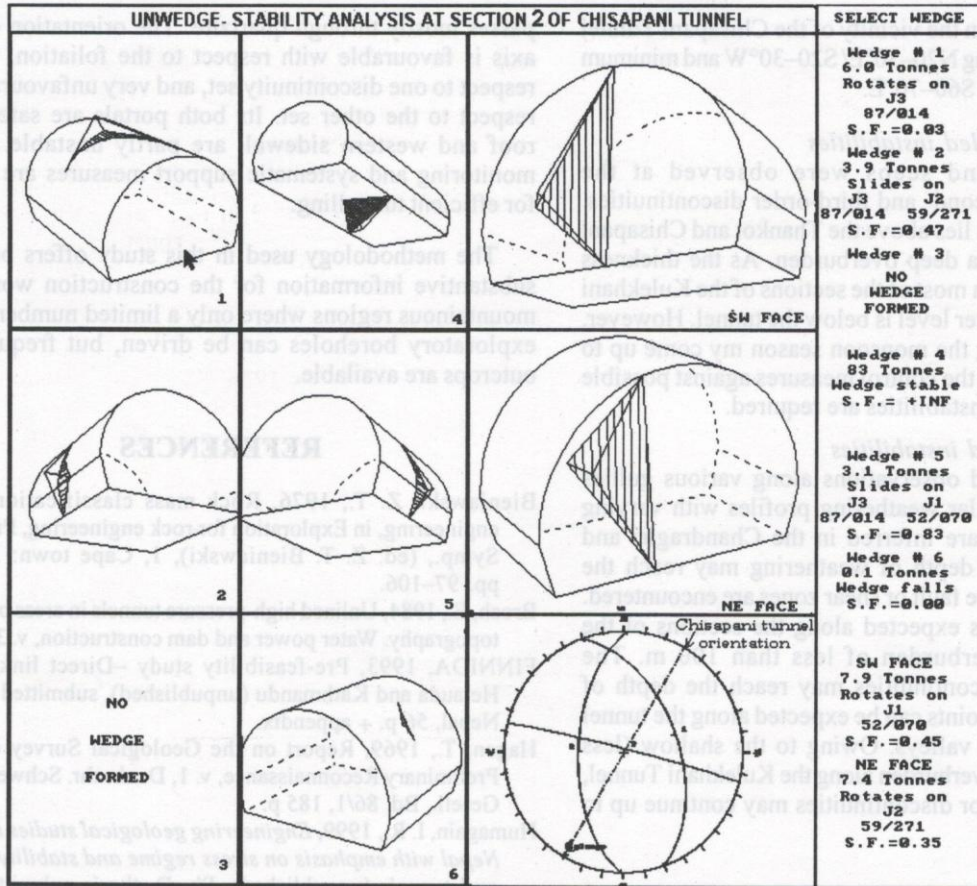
Structurally controlled instabilities in the Chisapani Tunnel
